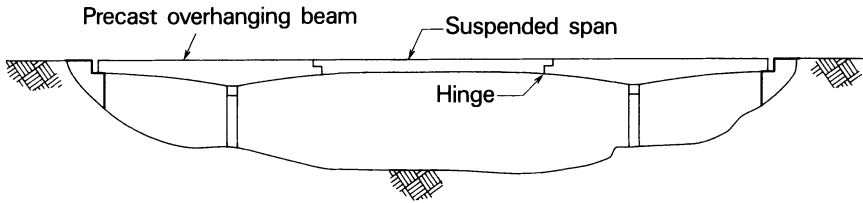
Bridge formed of precast prestressed-concrete girders with overhanging ends supporting precast prestressed-concrete girders suspended from the overhanging ends.
